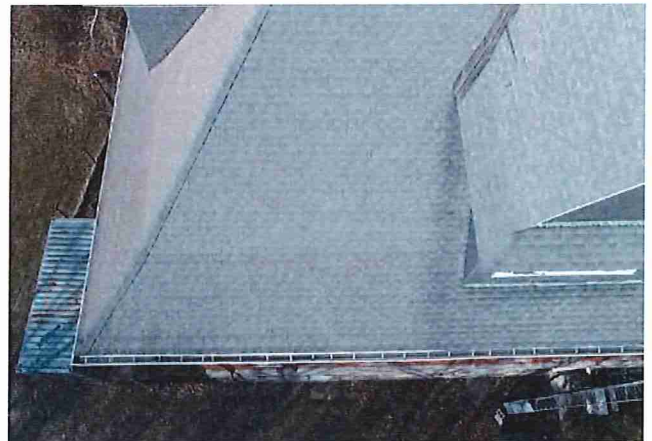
Drone image of the east side roof and gutter. The asphalt shingles exhibit scattered deterioration. The gutter appears clear of debris and obstructions to the downspouts.
